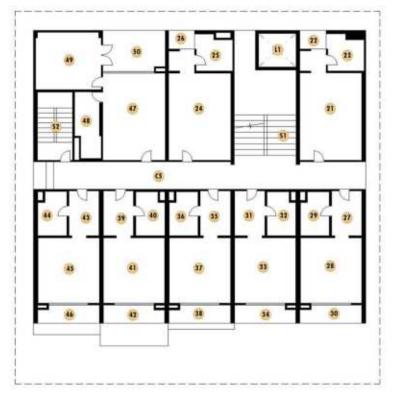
First-Fourth Floor Plan of HACHI Serviced Apartment
